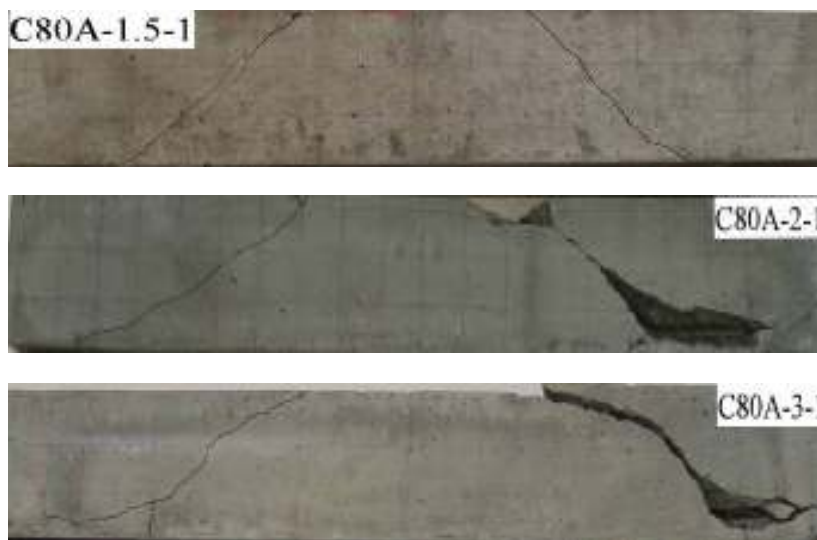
Typical crack development in HSC beams without stirrups
